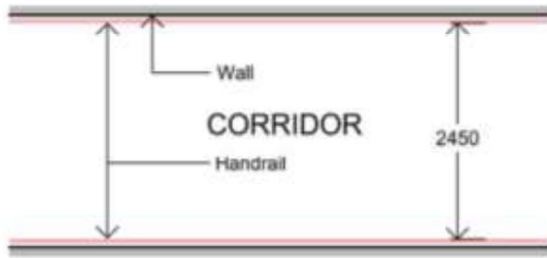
Corridor Plan – width clear of handrails and obstructions
